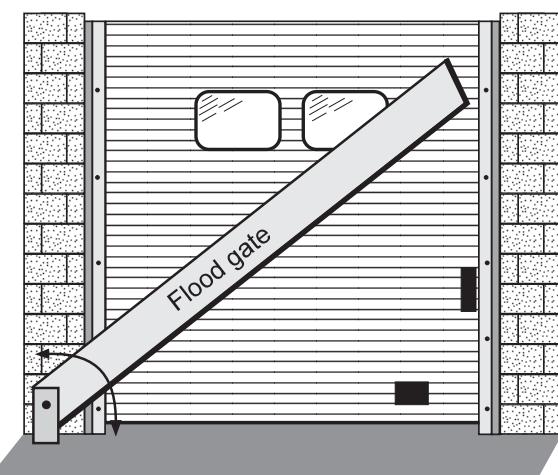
Pivot-type gate with a single pivot point
